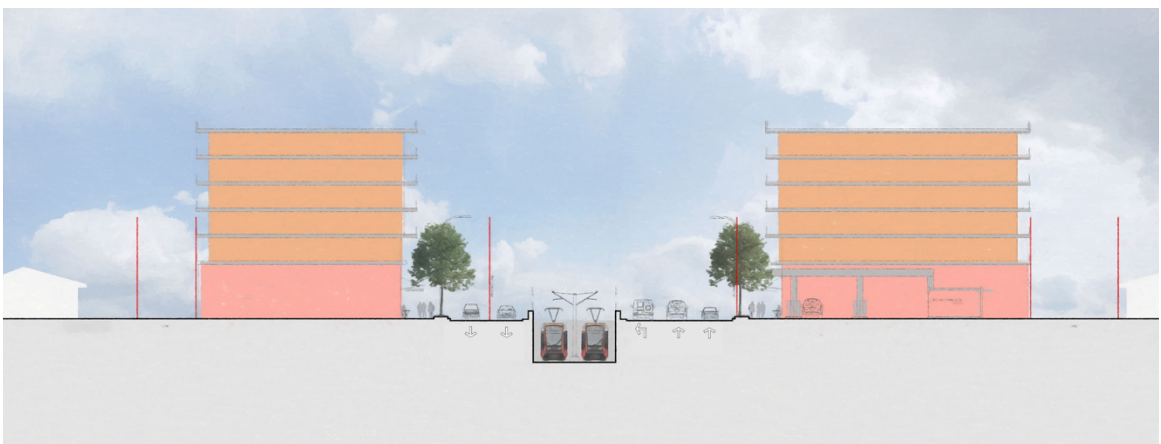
SECTION – LOOKING NORTH TO MCKNIGHT TUNNEL FROM LAYCOCK DR
